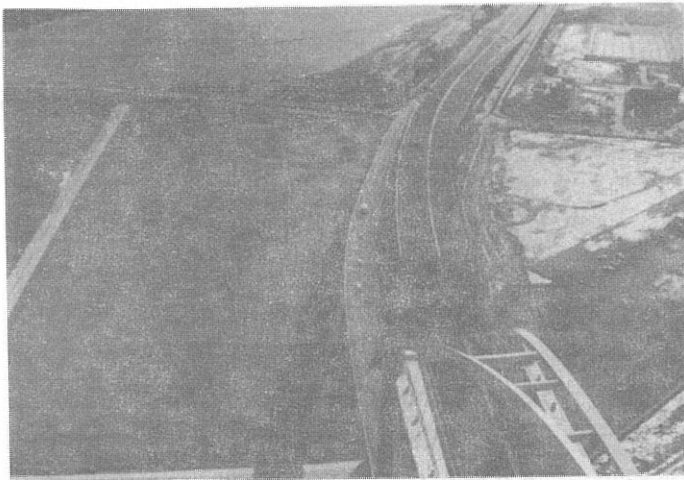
Collapse of a part of Hanshin expressway, Wangan route due to liquefaction and lateral movement
